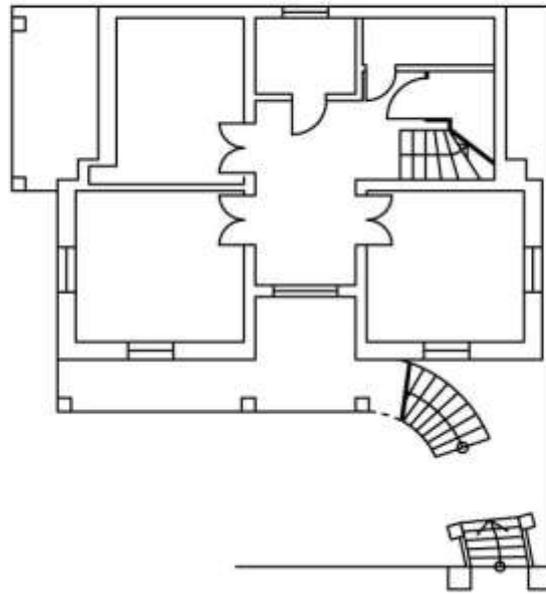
Ground floor plan of the house at 147 lot 3 parcel
